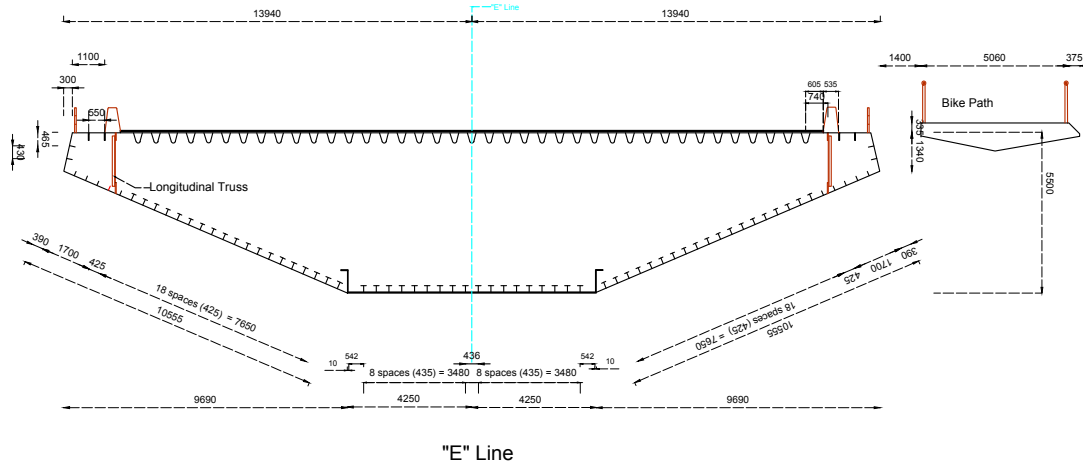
Typical Cross section of one deck (Ref.: AutoCAD made by the author, based on Caltrans' official project drawings).
